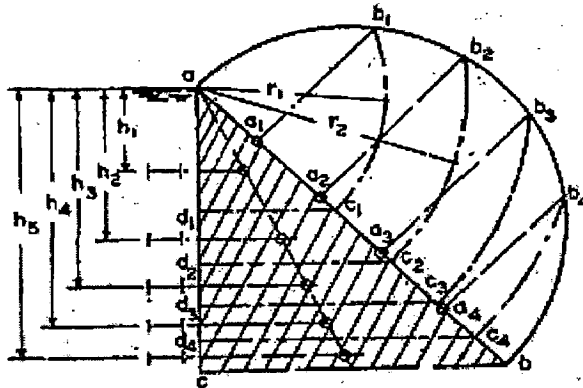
Spacing of girders on a barrage gate (Graphically).
